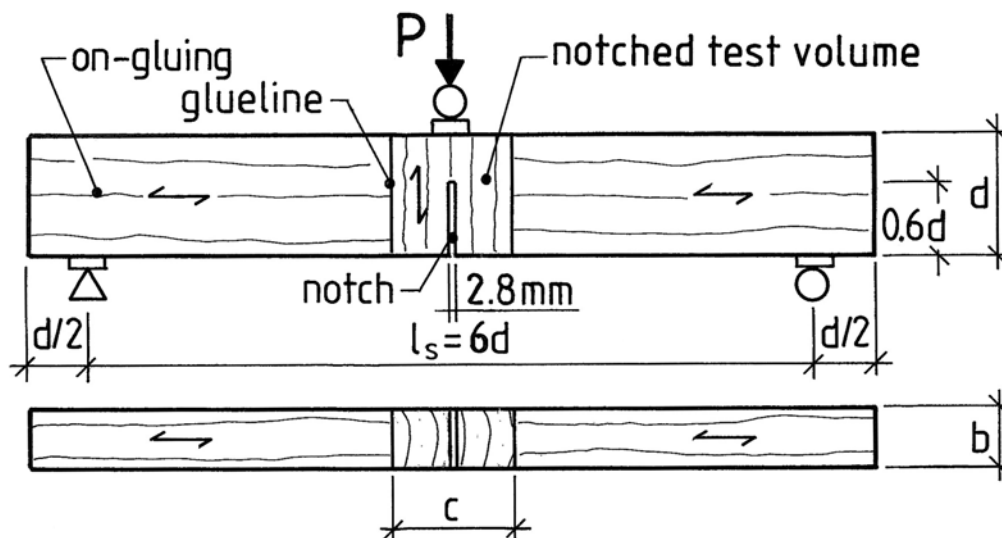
Specimen geometry and test scheme of single edge notched beam (SENB) specimen used in the MODE I size effect study.
